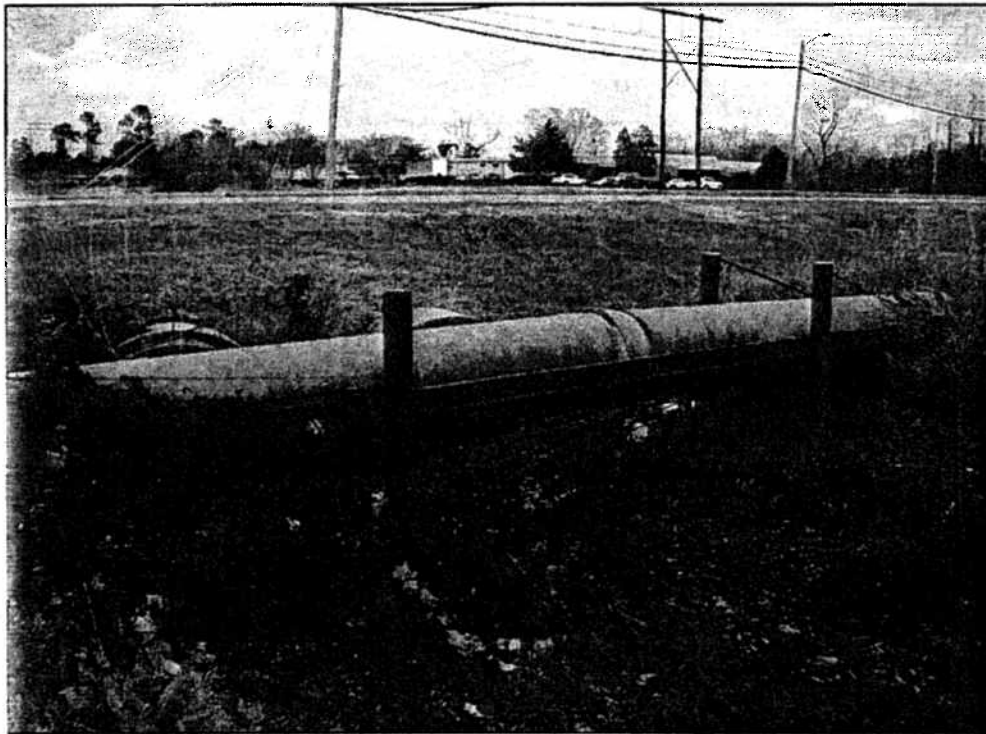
Canal crossing (Reed Road south of Hwy. 82). Steel pipe is inside the concrete pipe.
